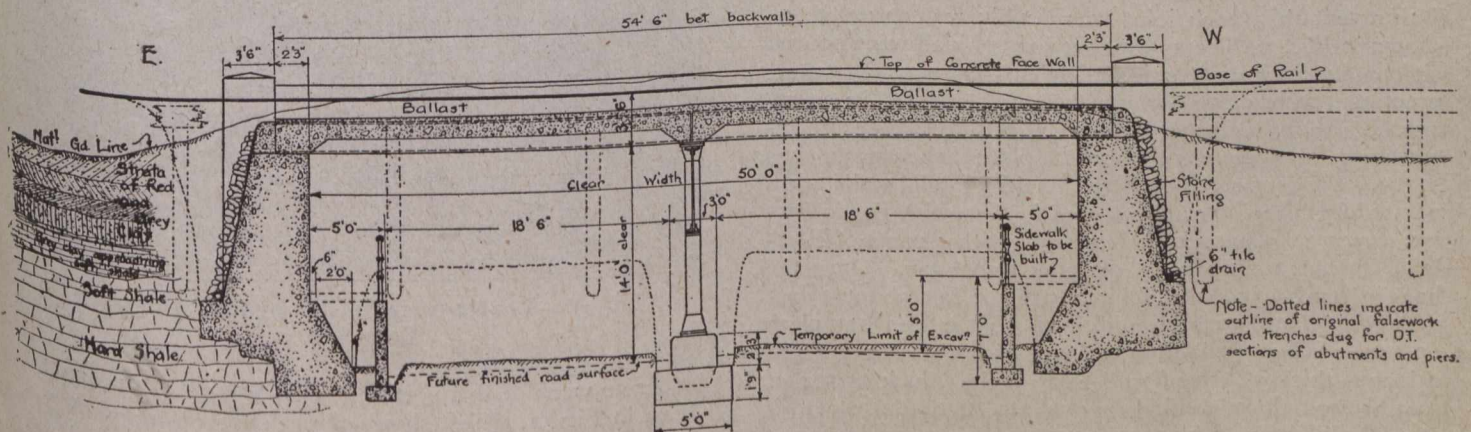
Cross-section of Bridge on Centre Line of Railway.
